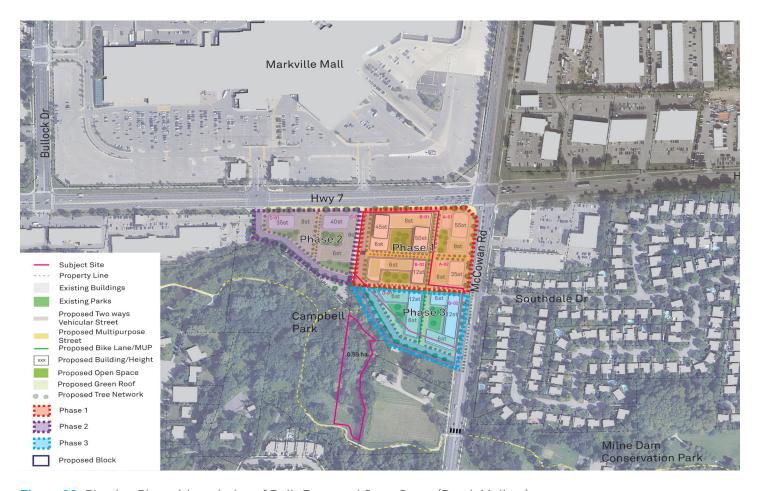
Phasing Plan with underlay of Built Form and Open Space(Brook McIlroy)
